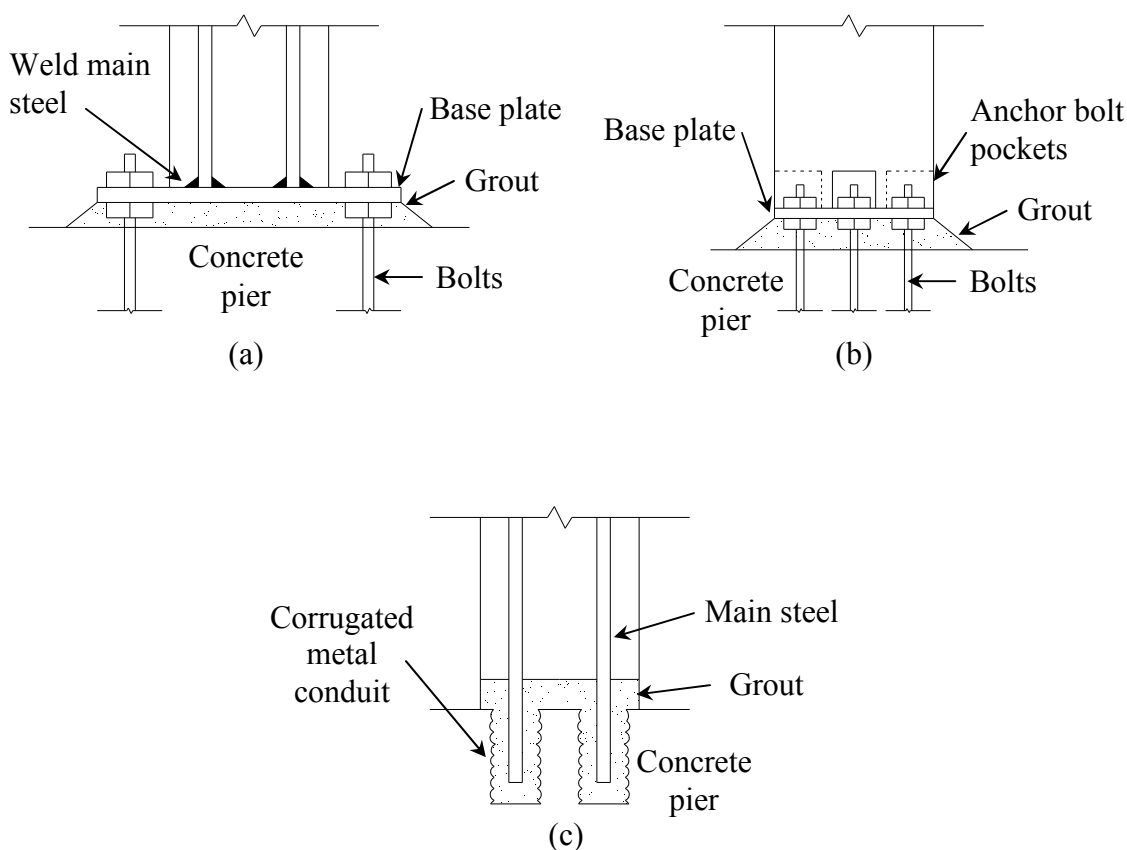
Column-to-footing connections (Nilson and Darwin, 1997)
